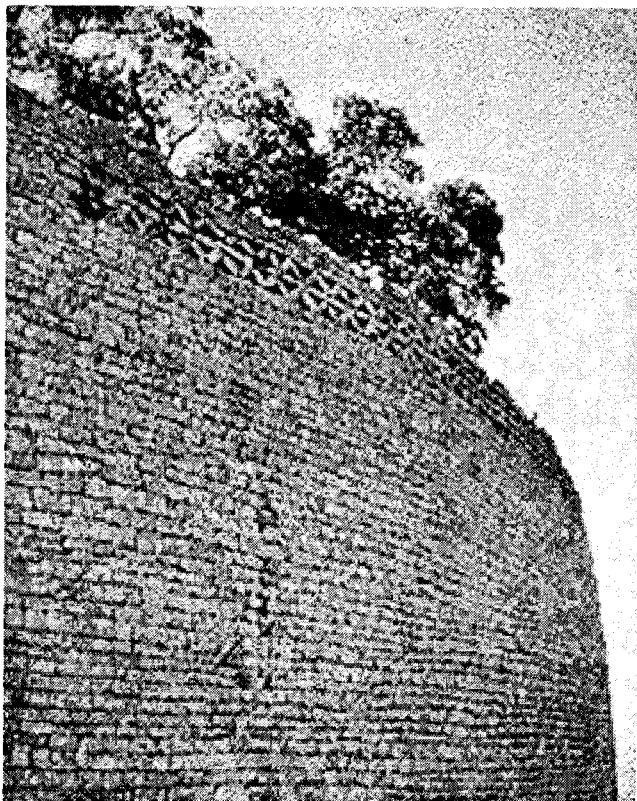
South dry stone and undressed wall of Great Enclosure, Masvingo Zimbabwe.
